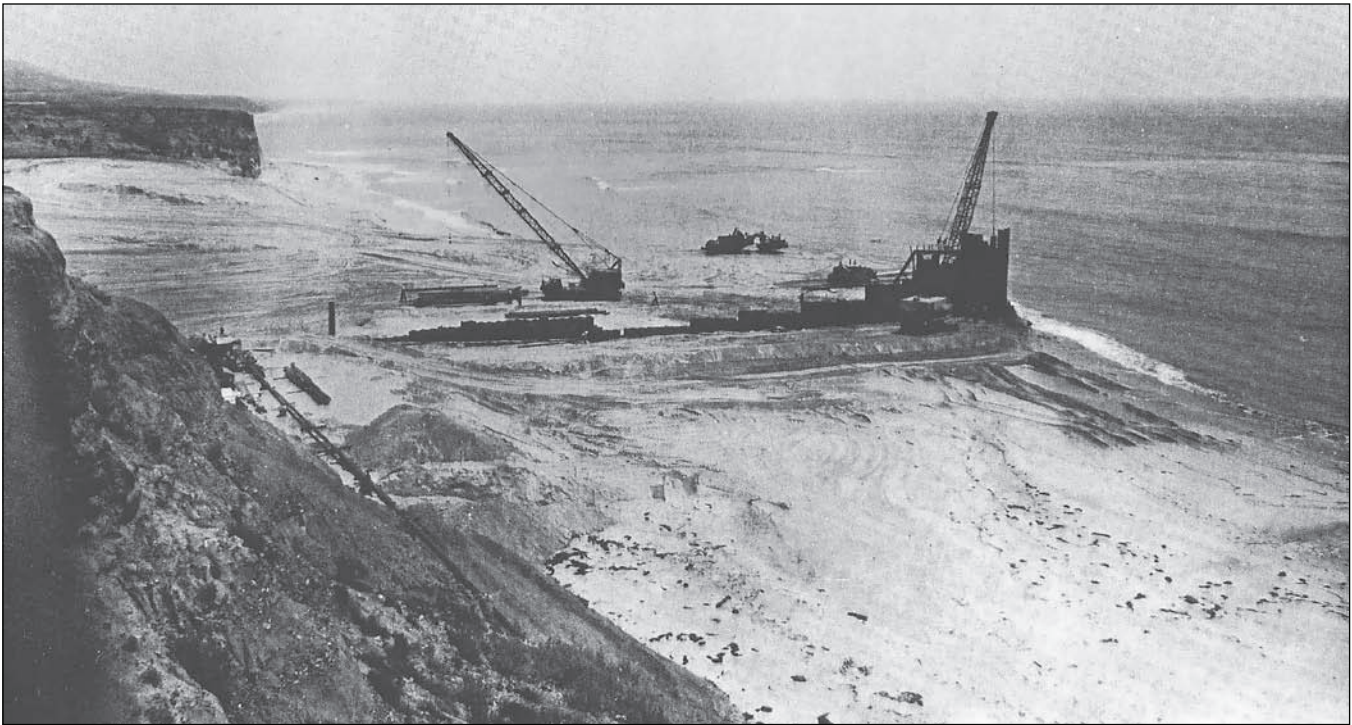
Photo showing construction of north wall of Unit 1 laydown pad on 4 June 1964 from Station A (see Figure 2).
